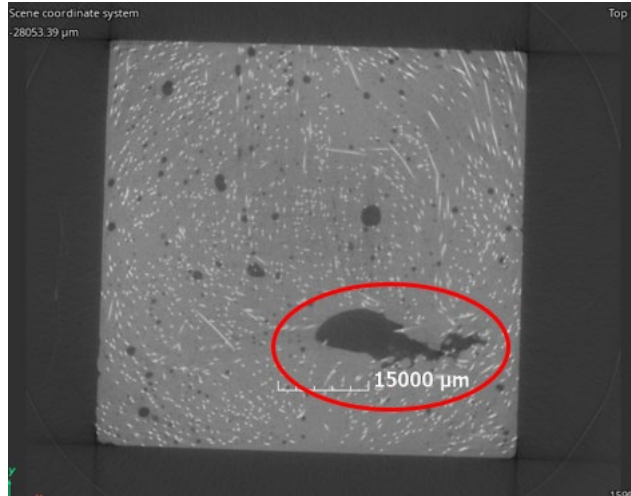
2-D view (side) of large air void at location where concrete was rodded from Figure 96
